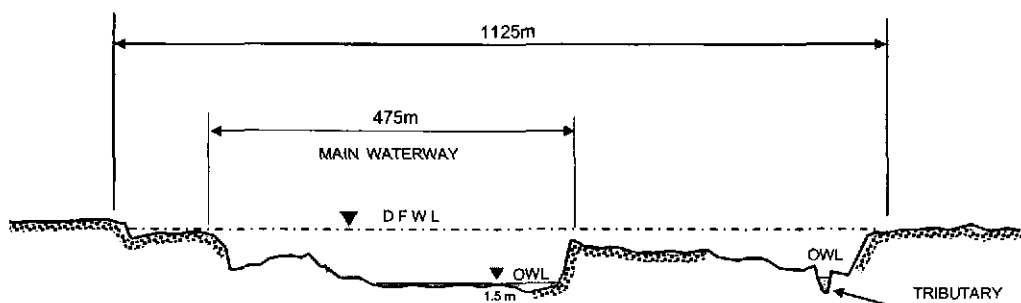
PAMPANGA RIVER SECTION AT PROPOSED SITE LOCATION
